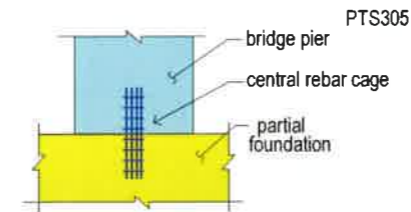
A-1 Hinge Simulation at Bridge Pier/Foundation Joint
